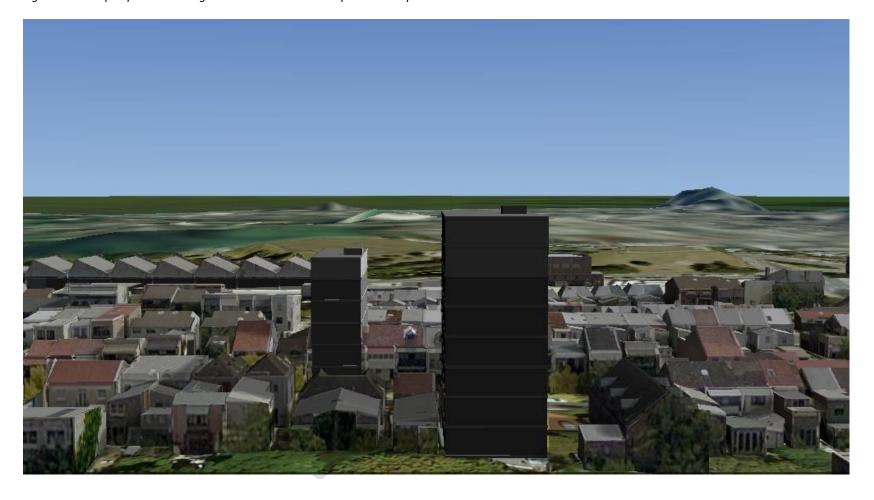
View from the corner of Mill Hill Road and Oxford Street looking south with isolated examples.
